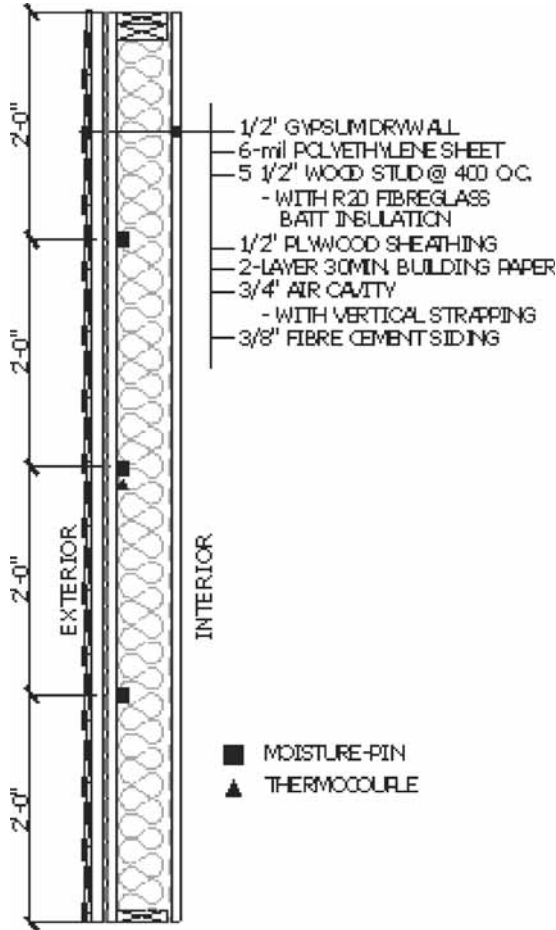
Vertical cross-section of the instrumented rain-screen wall system.
